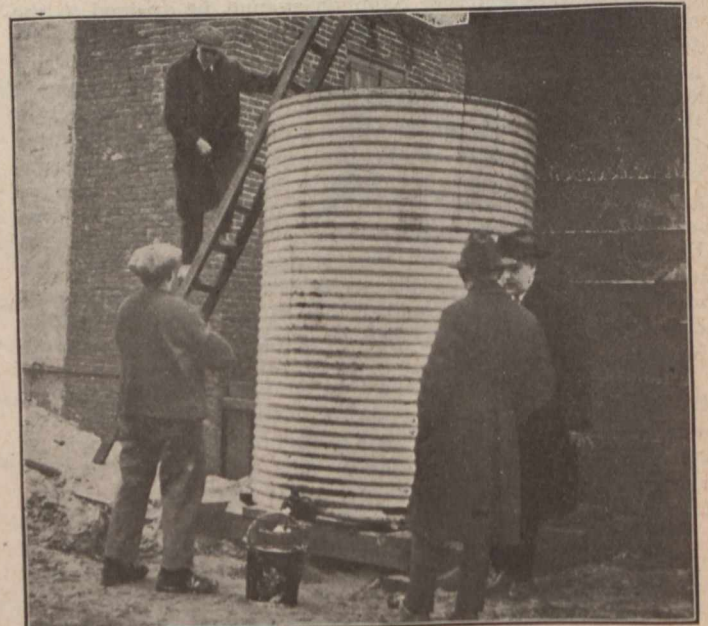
INEXPENSIVE MUNICIPAL STORAGE TANK
